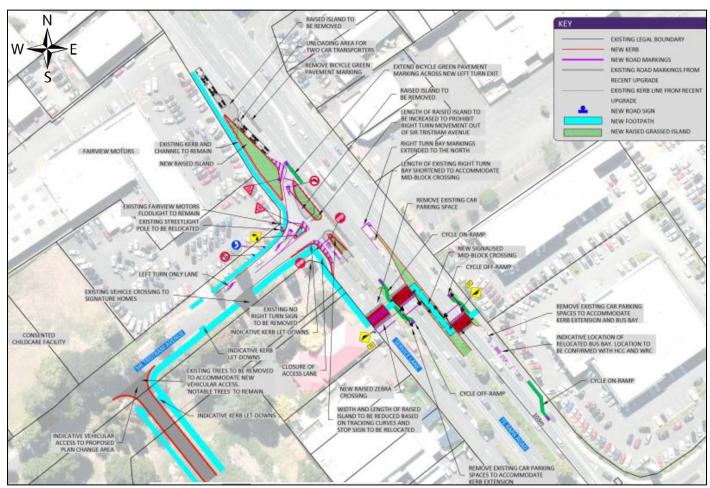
Proposed changes to Te Rapa Road / Sir Tristram Ave intersection
